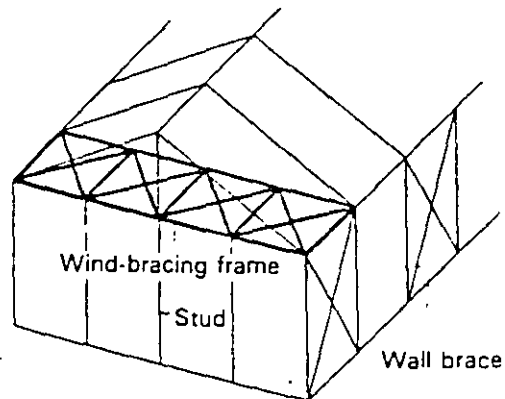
Treatment of wind pressure on cross-beams by means of roof braces
